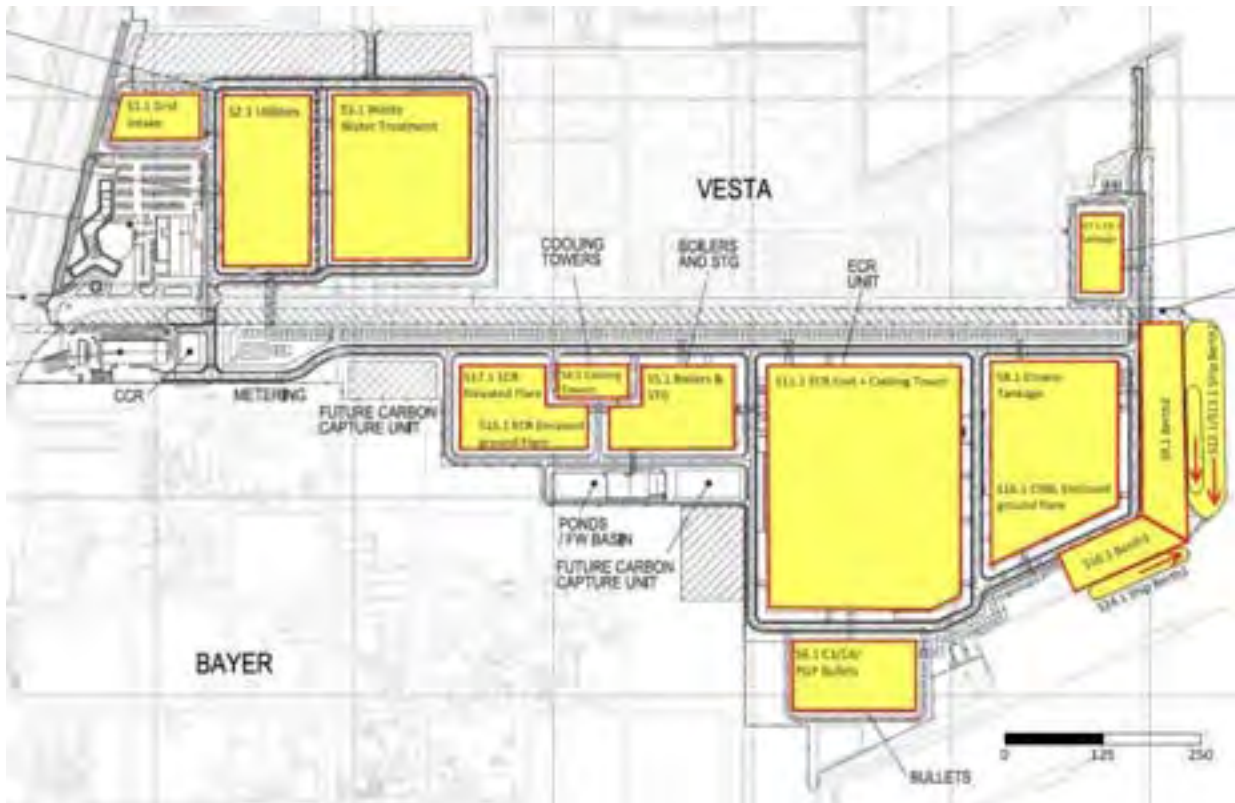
Layout plan showing the location of the emission-relevant installation zones, flares and ships in the project area.
